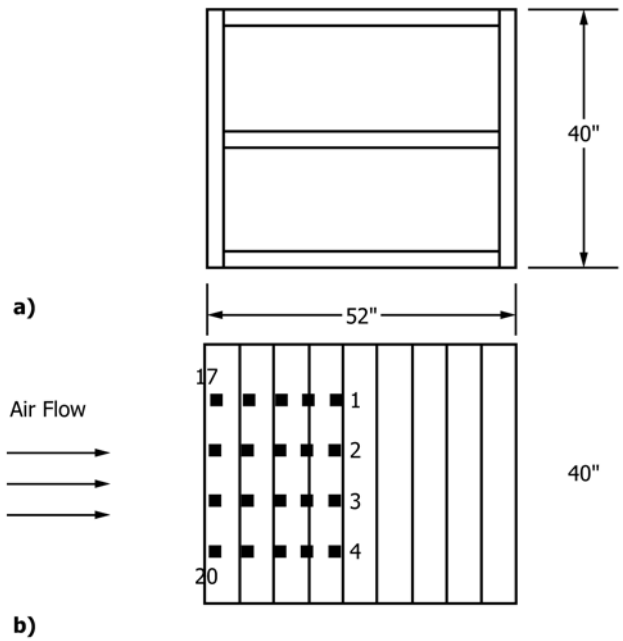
Test Specimen Assembly: a) Lumber Frame, b) Deck Board and Brand Placement
